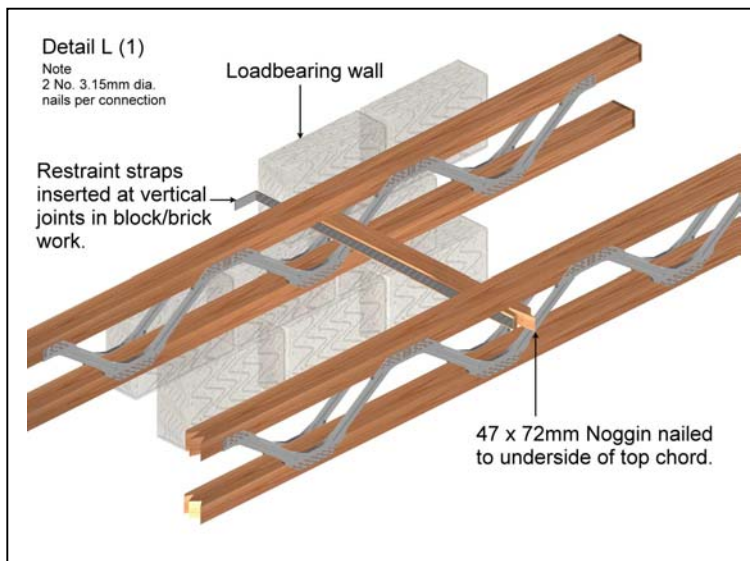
Wall Restraint Strap Detail for Open Web Joist.
